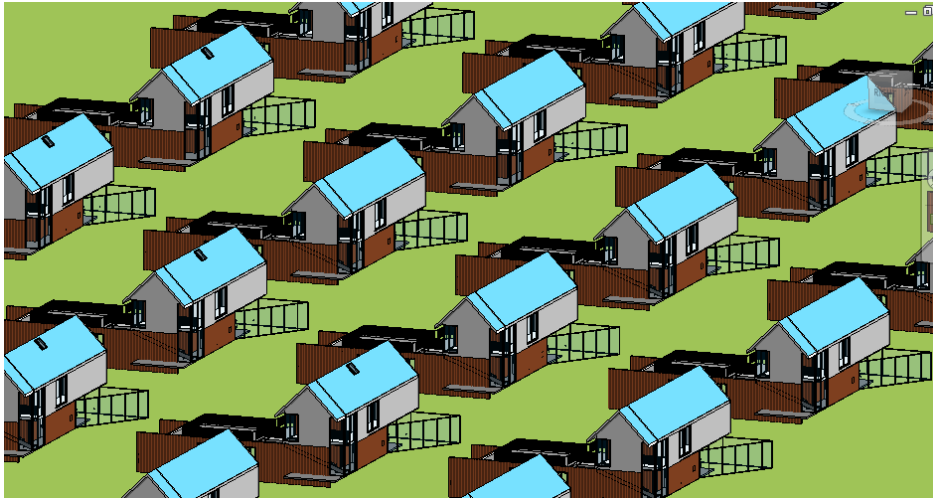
Revit 3D modelling of multi-building project site with rooftop solar PV panels and wind generators
